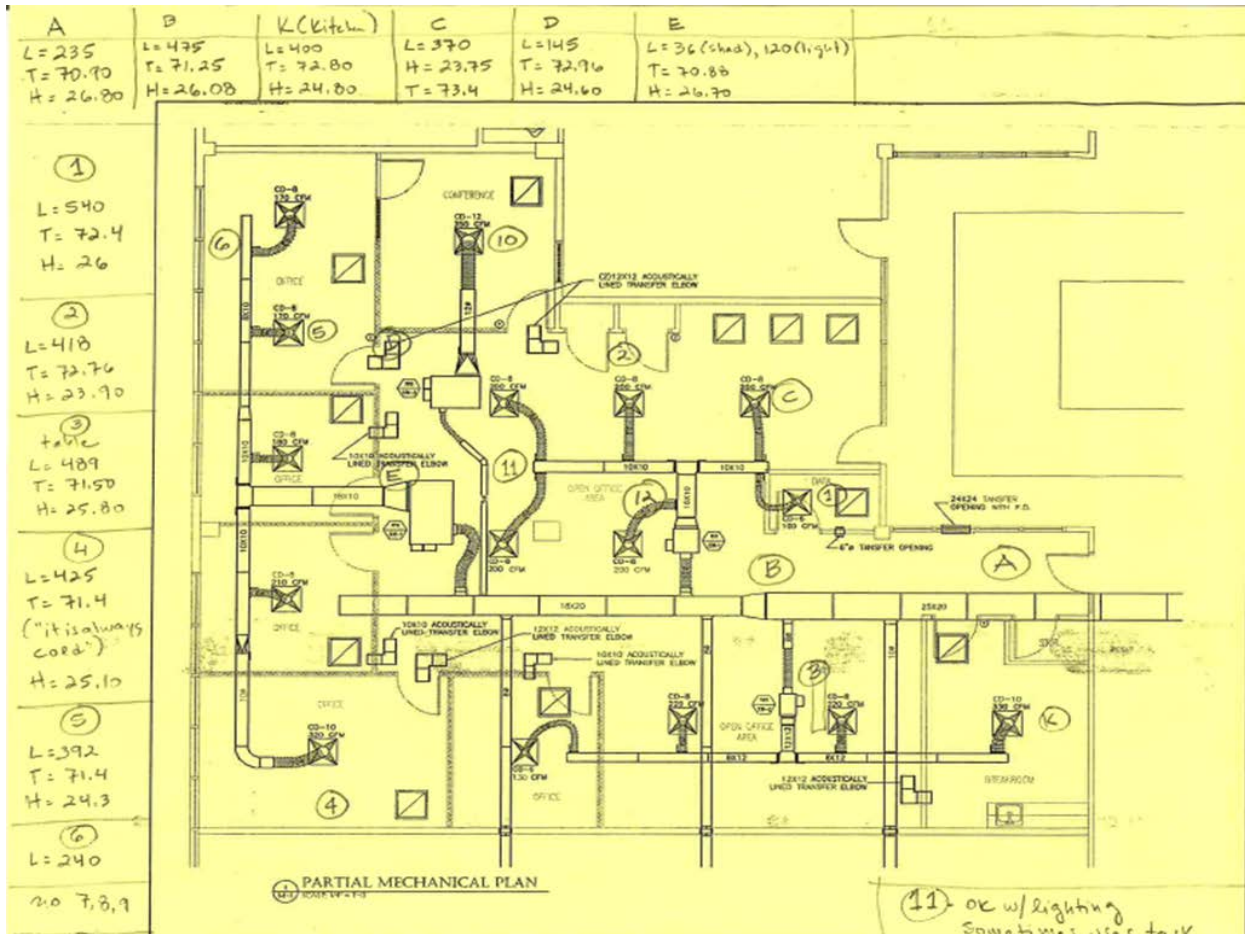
Example of working plan with lux and location measures for post-retrofit site visit. Close up of plan image cropped from original.
